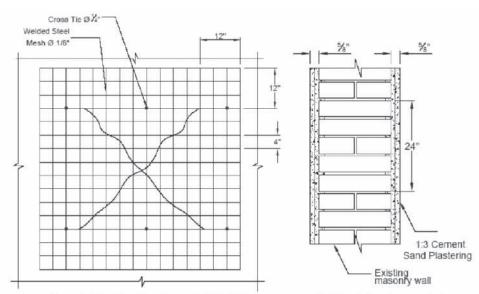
Repair of heavily cracked brick/block masonry wall with reinforced cement jacketing
